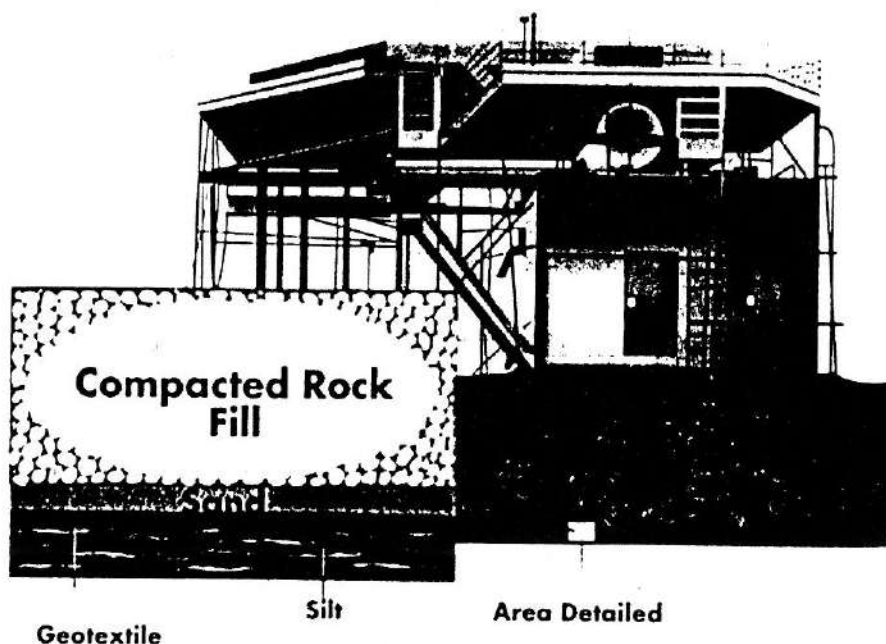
Cross-section of heavy duty fabrication yard over soft-reclaimed land near Haldia Port
